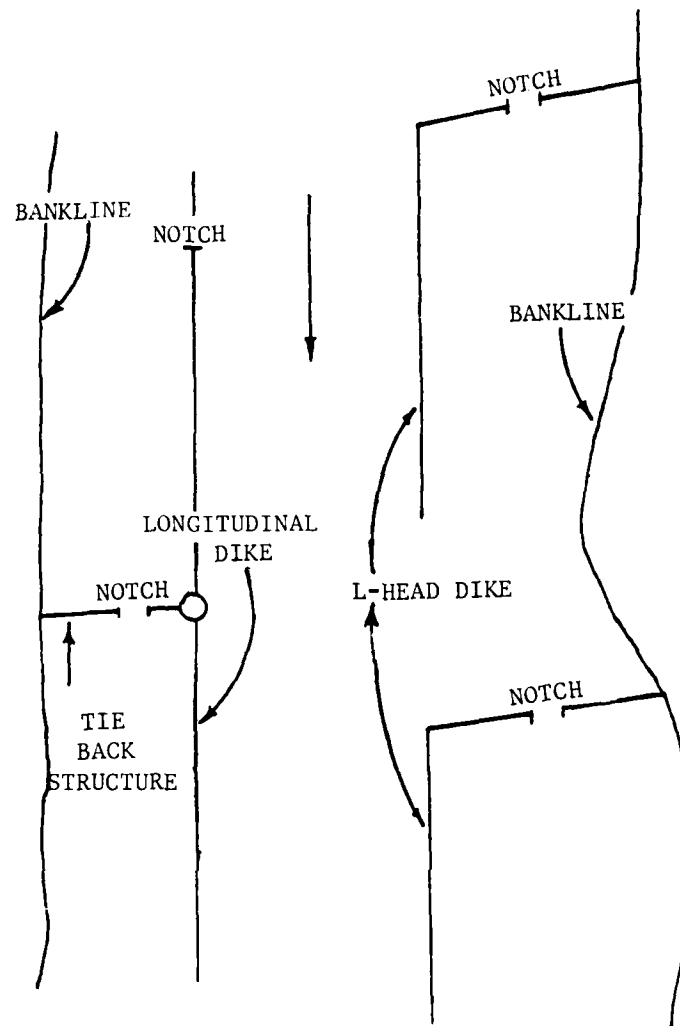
Examples of L-head and longitudinal structures where notches should be considered in pairs
